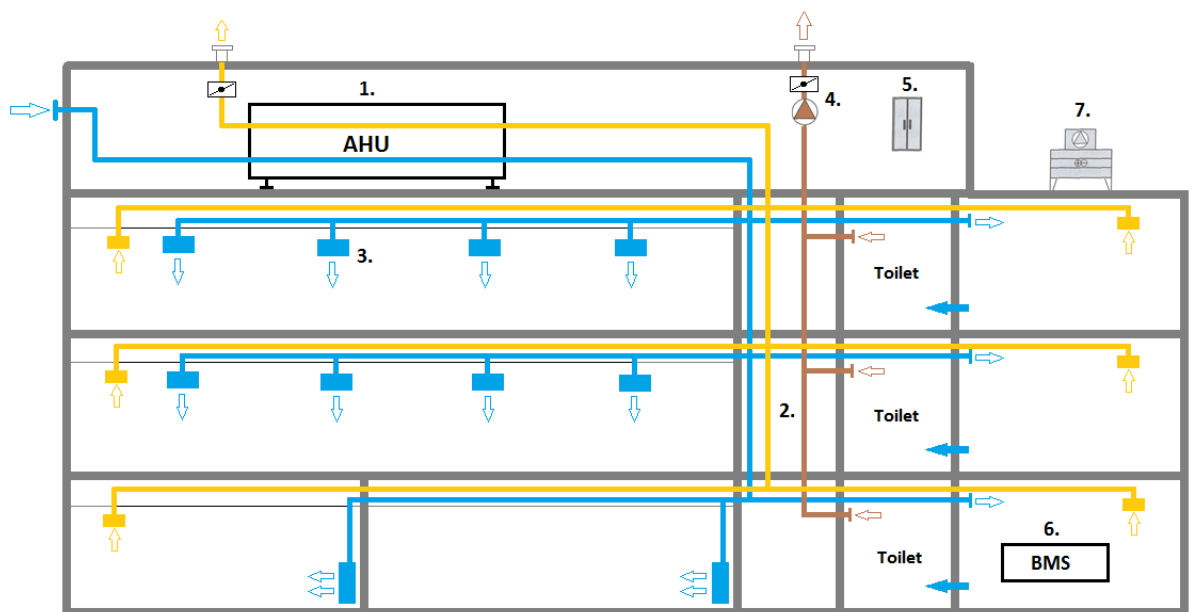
Common parts of ventilation or air-condition system situated in the building: 1. Air handling unit, 2. Channeling network, 3. Room devices, 4. Separate fans, 5. Electric system, 6. Building automation system, 7. Cooling system, 8. Heating system (does not show in the figure). (Sandberg, Esa et al. (1), 2014, p. 22)
